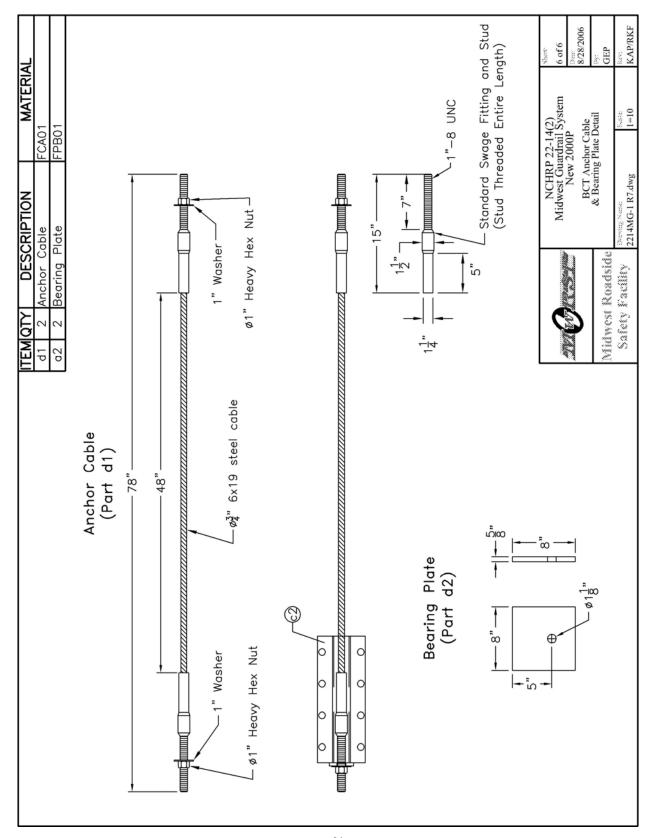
Midwest Guardrail System Anchorage Details (English)
